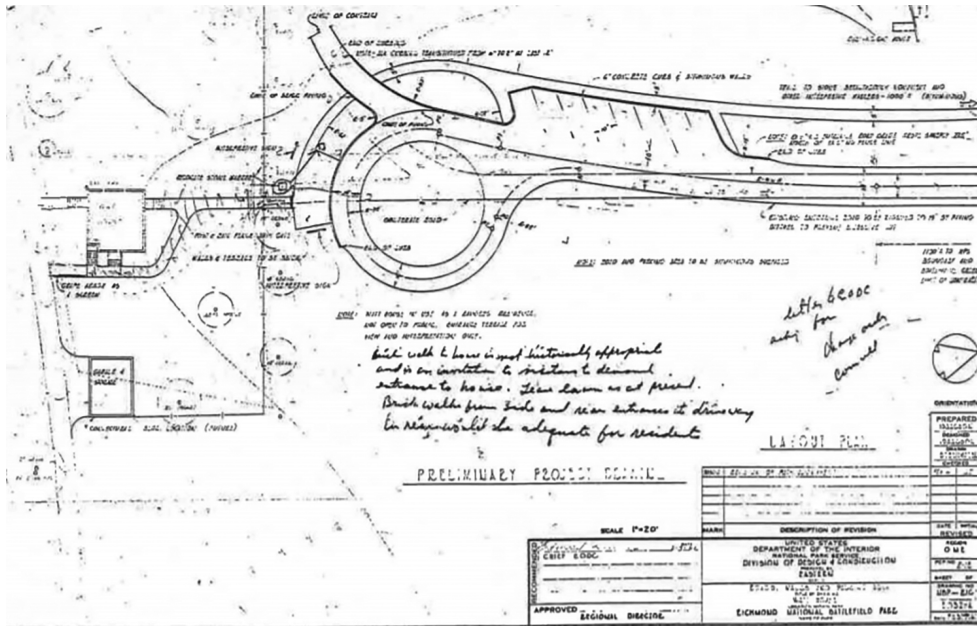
Proposed roads, walks and parking area, Watt House, 1961. Also showing existing layout of fences and locations of existing trees. (RICH Archives, Drawing 367-3032)
